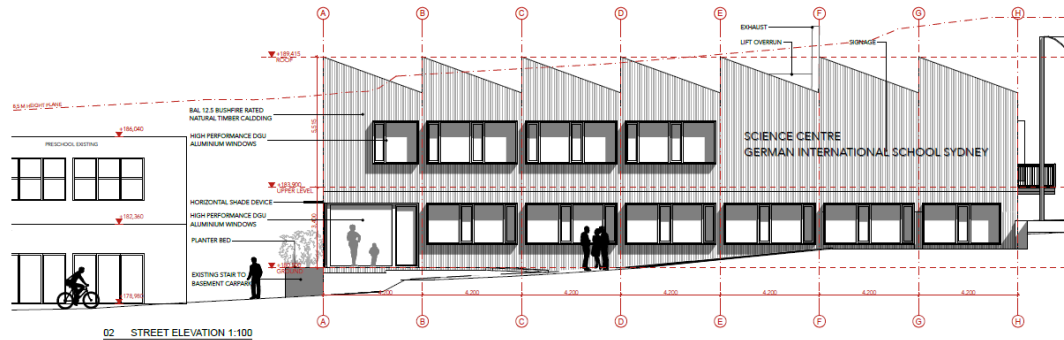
Street elevation of proposed science building (Source: Betti&knut architecture)
